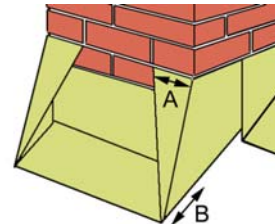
(above): This chimney corner flashing (left), although folded, was installed incorrectly and will surely leak. A properly folded corner flashing must account for the water that runs down the chimney as well as the water that runs down the roof. In effect, the flashing should create a mini-roof over each corner.
